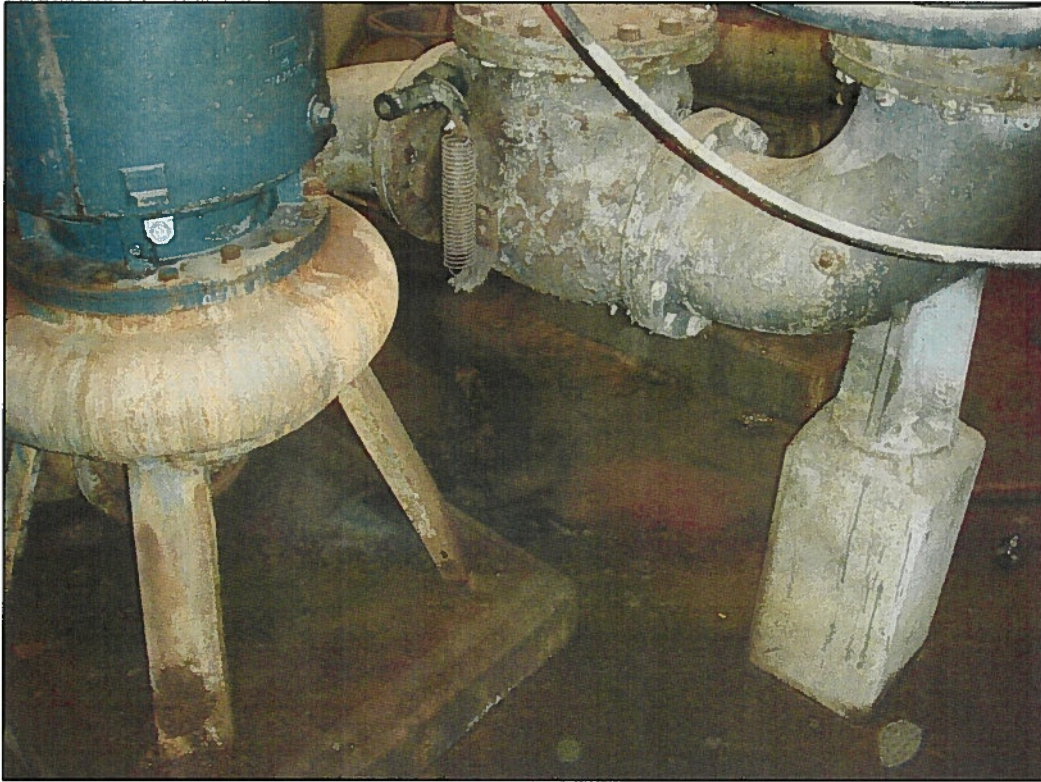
South Theobald pump station dry well (note valve leak on floor causing stain).
